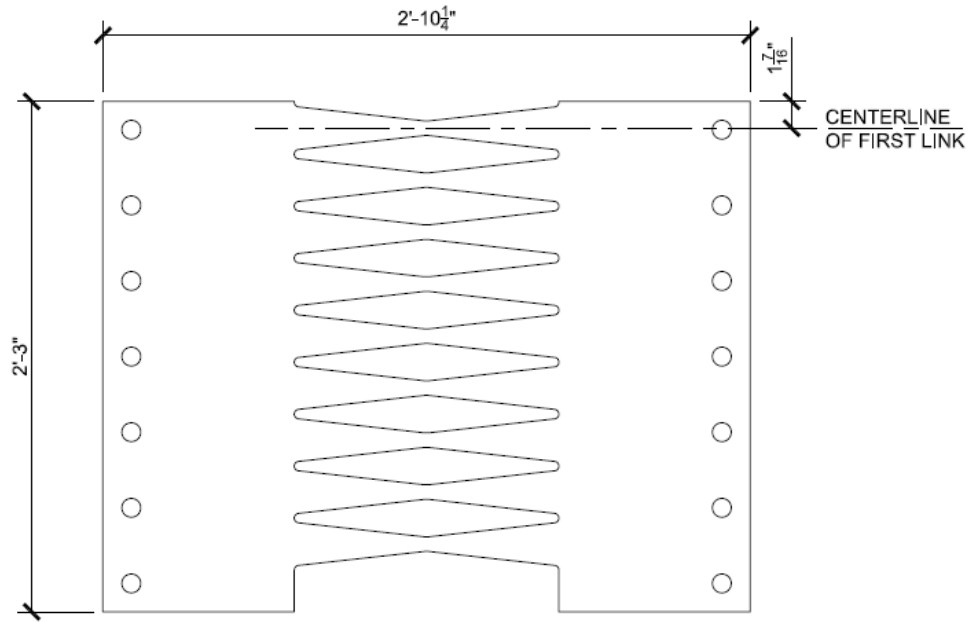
Specimen Design Drawing – Fuse for Test B1 and B3
